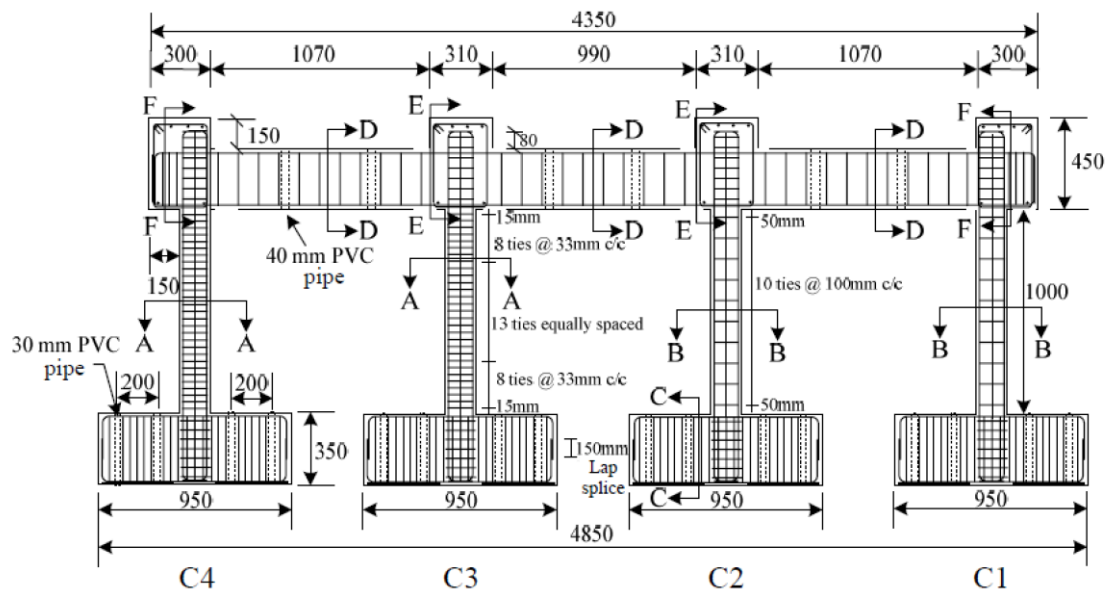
Specimen P1/P2 design layout (Guo 2008)
